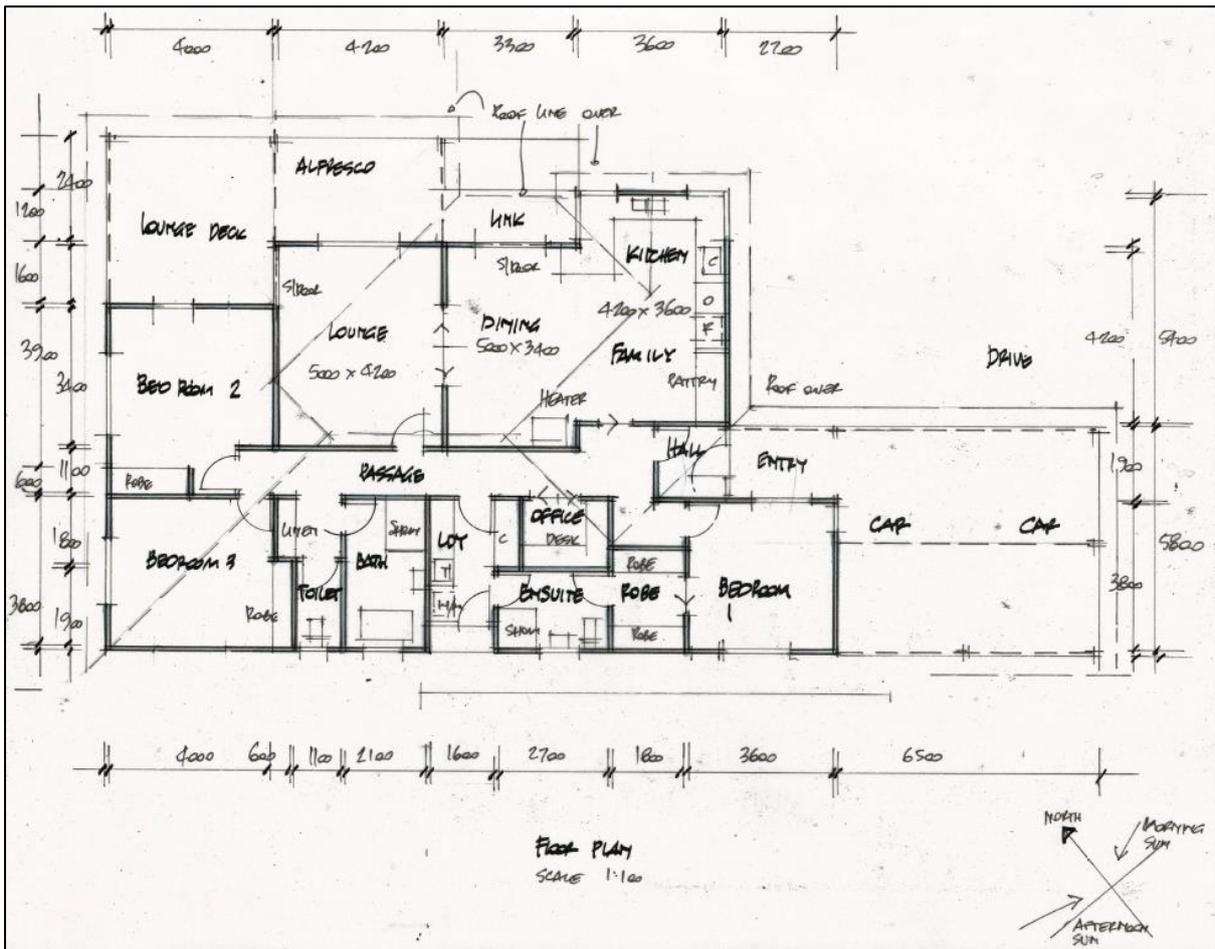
Farm dwelling floor plan (Source: Building Design Service).
